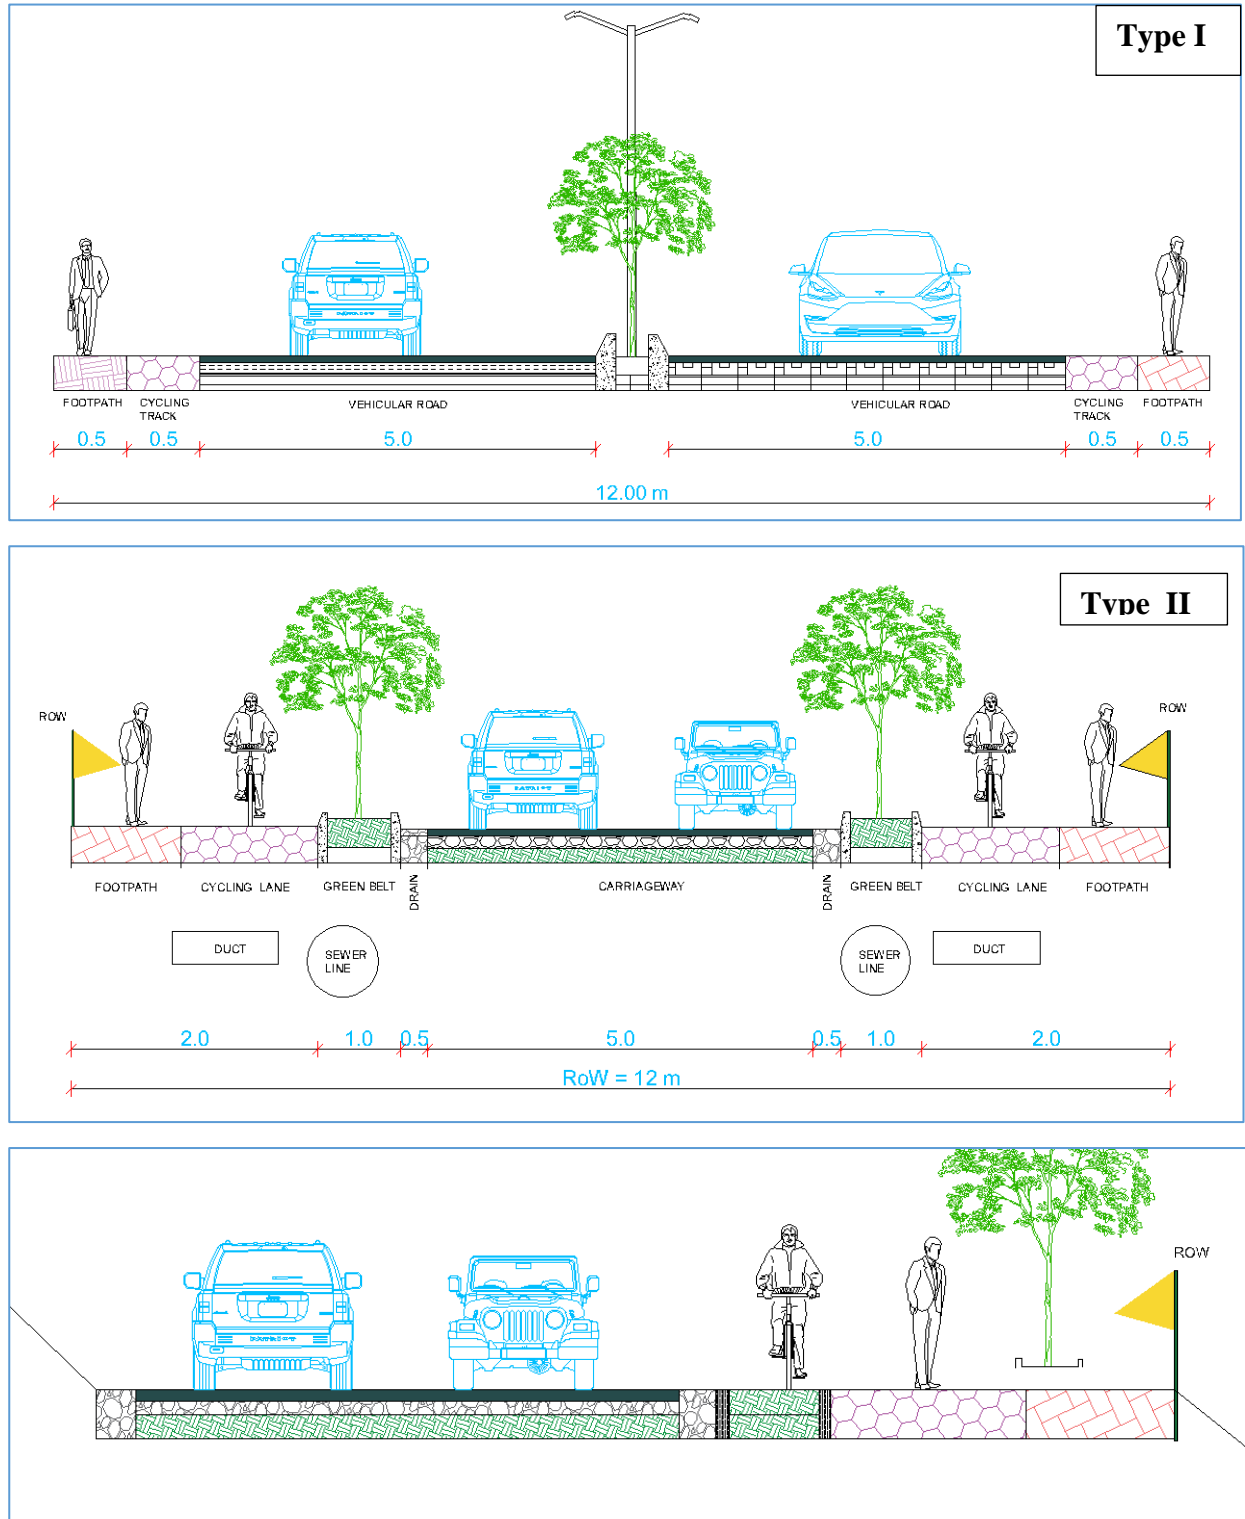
Typical Cross Section of Arterial Road (Class A)
